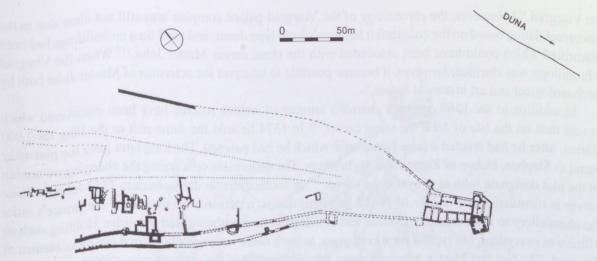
Reconstructed ground plan of the castle of Buda in the mid-fourteenth century
